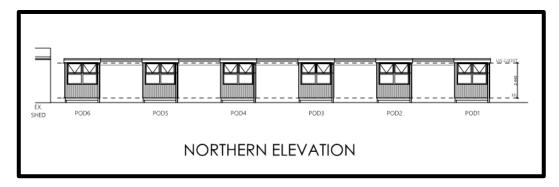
Northern elevation of proposed accommodation pods (Design to Live, 2017)
